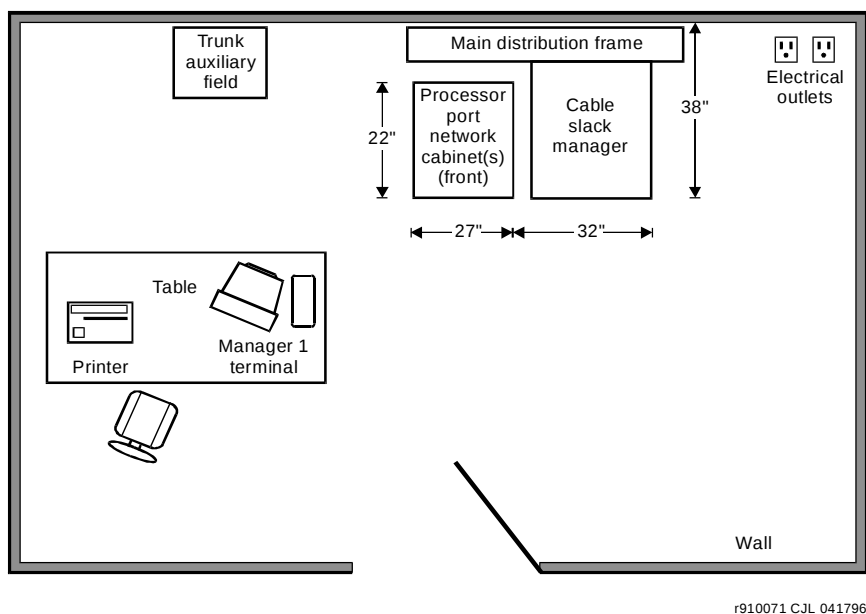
Typical Single-Carrier Cabinet Floor Plan
